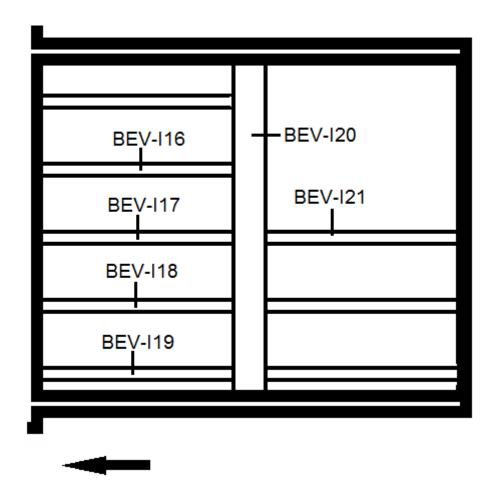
Sketch of basement ceiling, showing the location of samples BEV- I16-21
